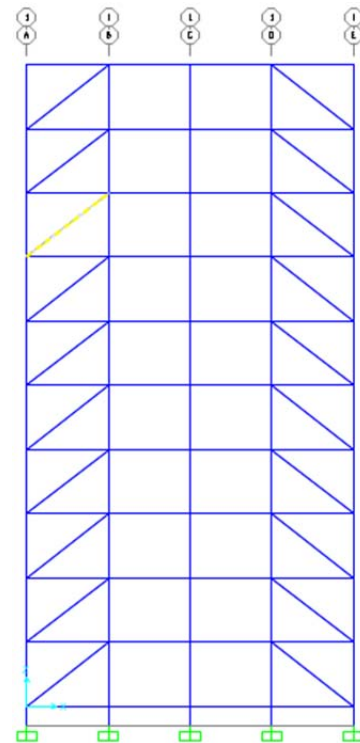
Elevation of Frame in Z direction(vertical) for steel frame with Single Diagonal Bracing
